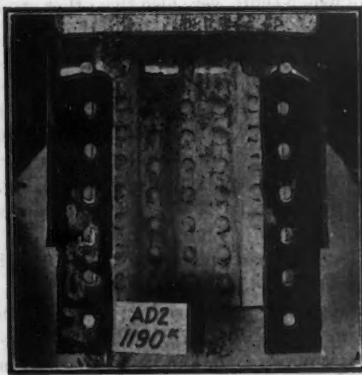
SPECIMEN AD2, BOTTOM EAST
